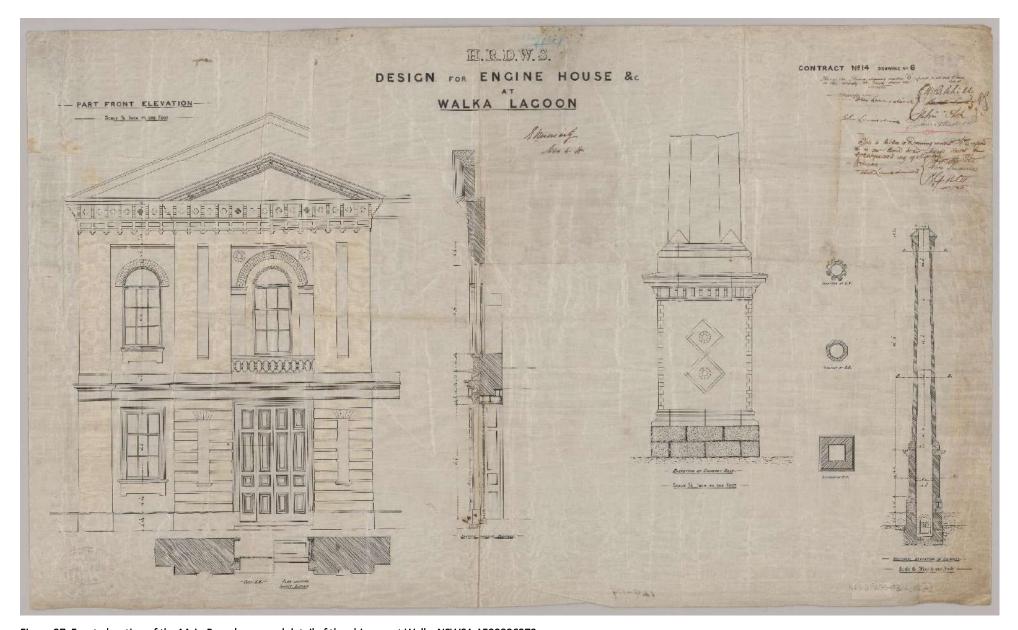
Front elevation of the Main Pumphouse and detail of the chimney at Walka NSWSA AF00086372
